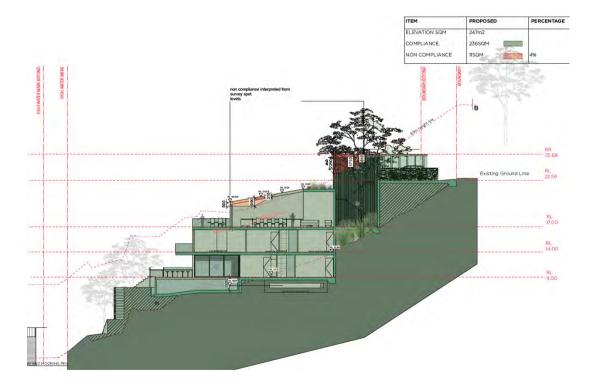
Height Section Diagram showing the sections of the proposed dwelling that exceed the height control (shaded orange)
